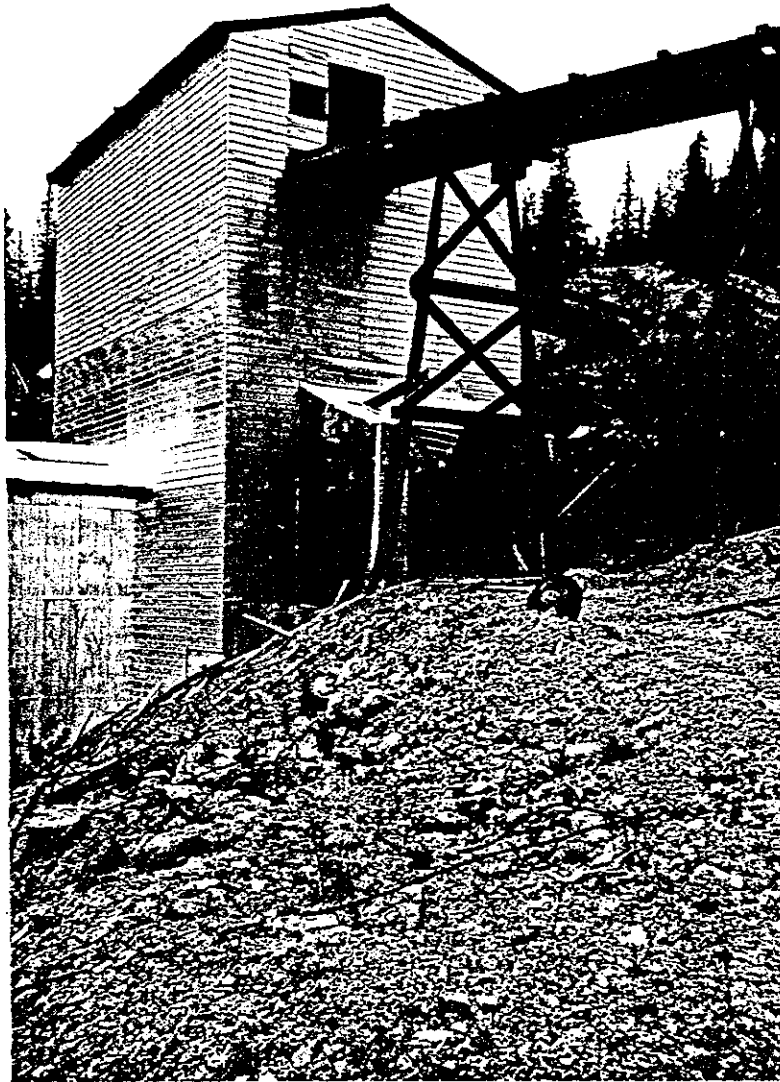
ABANDONED 1965 MILL ON LAFORMA PROPERTY. BUILDING ACCESS IS NOT IMPAIRED. NOTE: EXCELLENT CONDITION OF ALUMINUM BUILDING.
